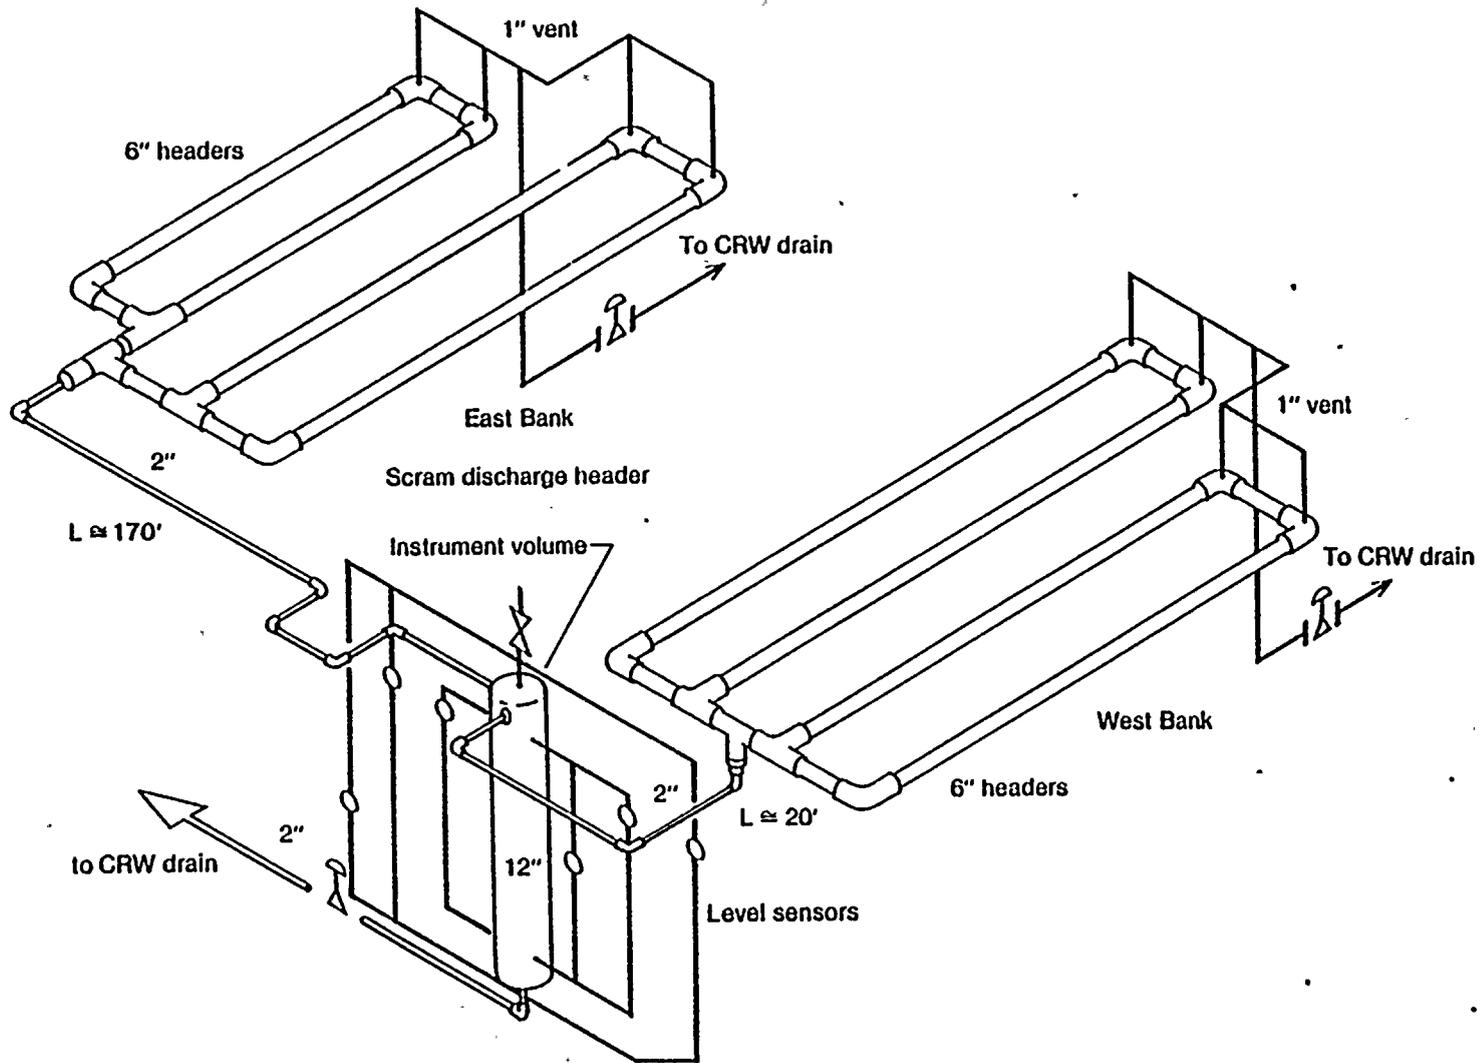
Browns Ferry SDV Equipment Layout (isometric view)
